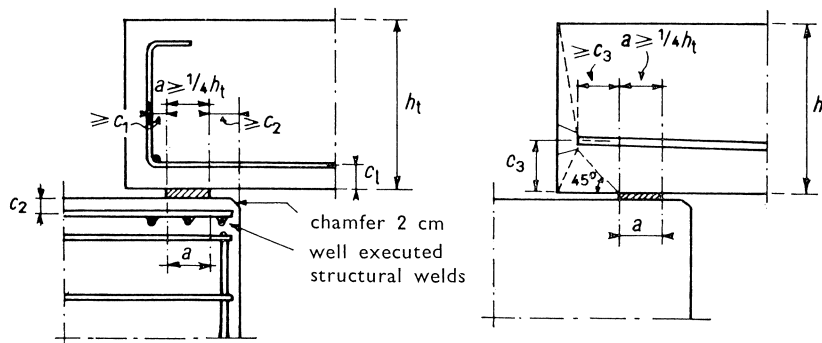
Detailing of the bearing provided with conventional reinforcement (left) or utilising the prestress (right).
